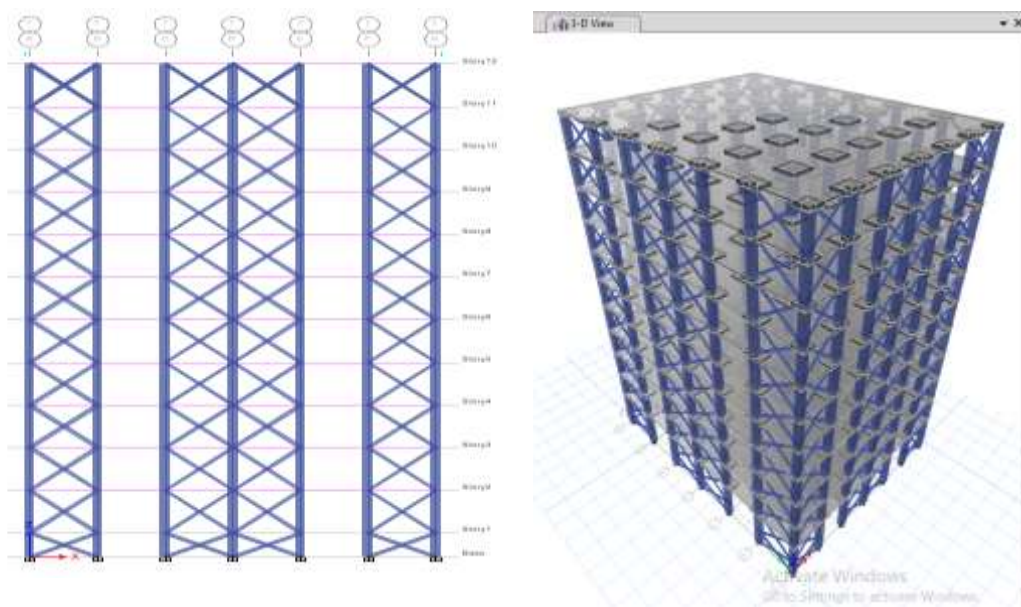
Elevation and 3D view of Multi-storey building with cross bracing at corner and at centre
